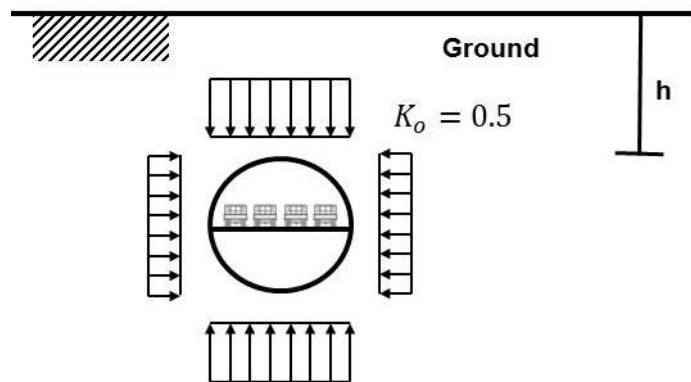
Load condition of beam-spring model for double-deck tunnel
